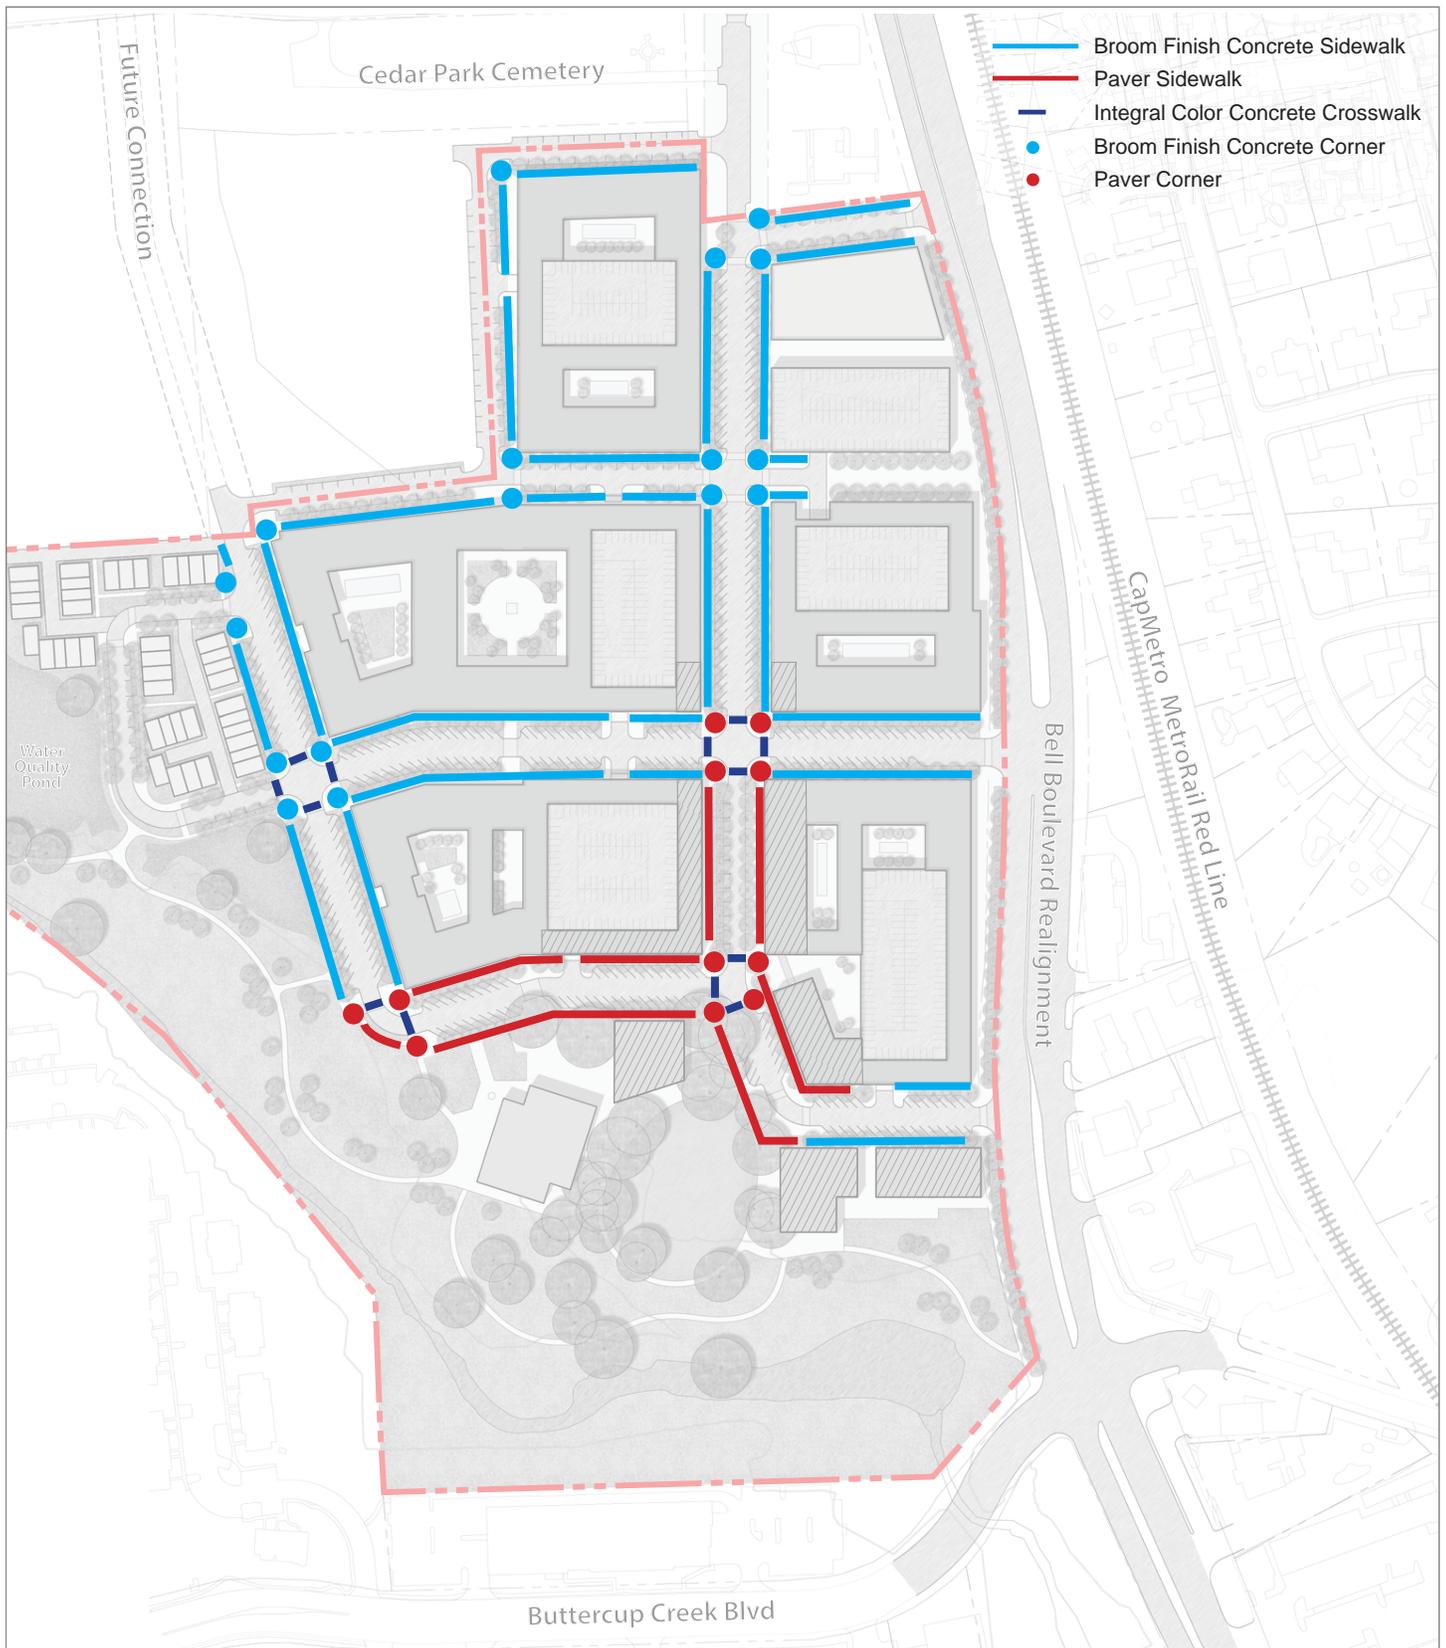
RECOMMENDED SIDEWALK AND PAVING TREATMENT PLAN
